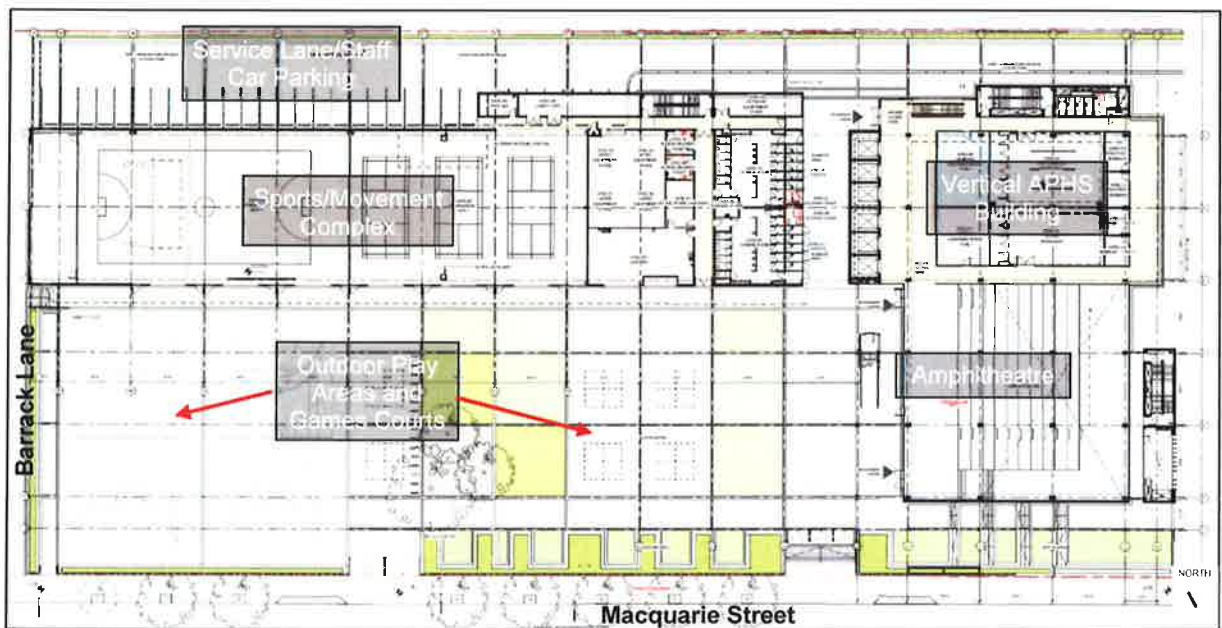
APHS Project site layout (Ground Floor Plan) (source: Applicant)
